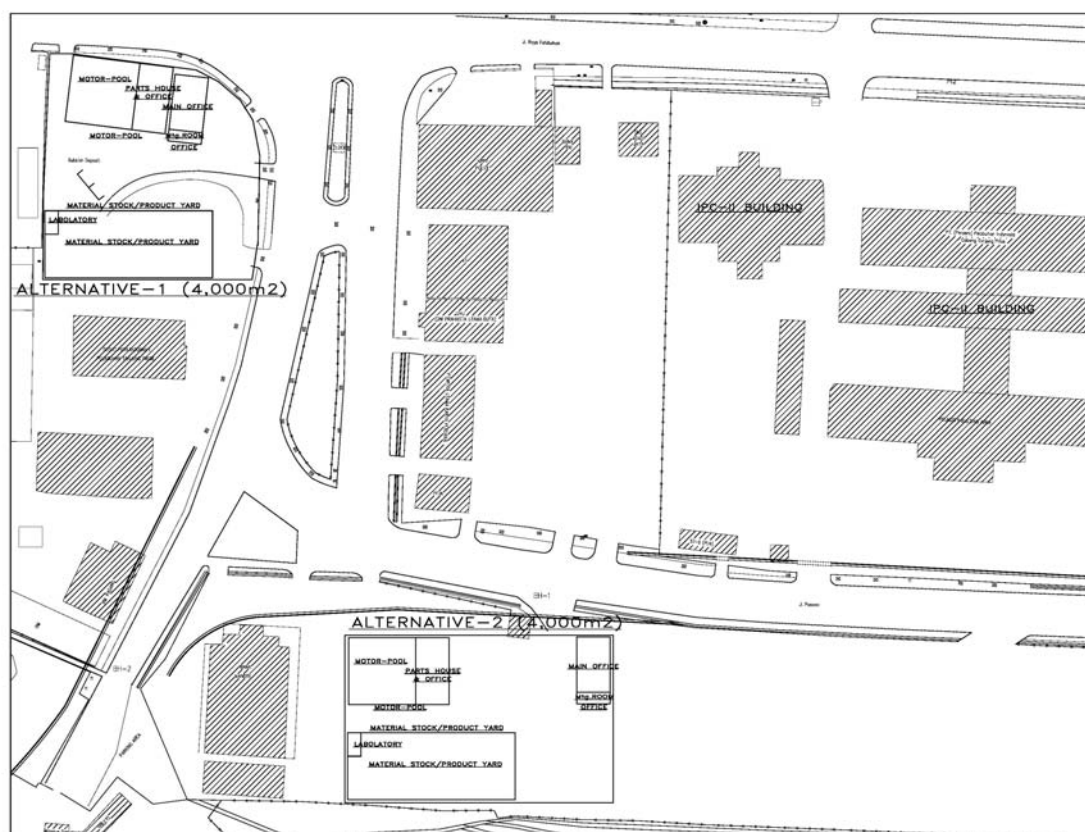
Proposed Location of Construction Yard for Port Inner Road
